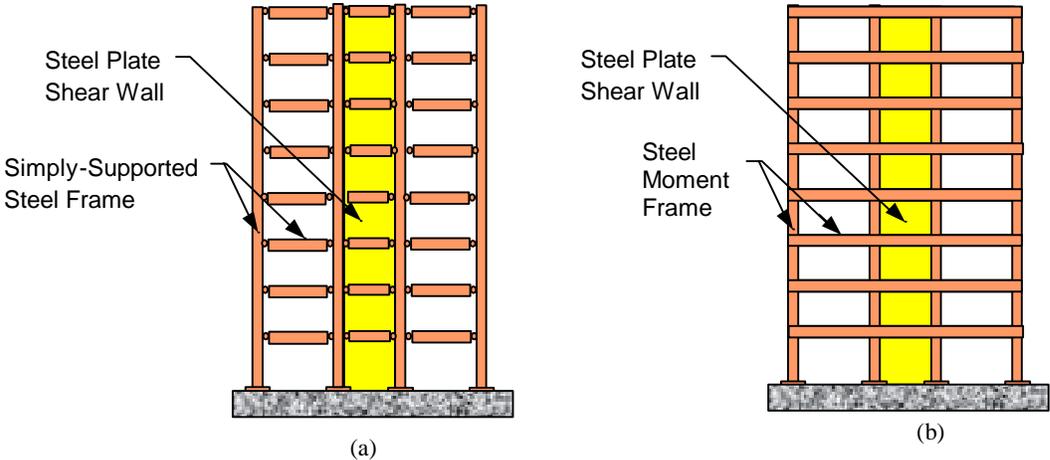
Two types of steel plate shear walls: (a) standard and; (b) dual system
